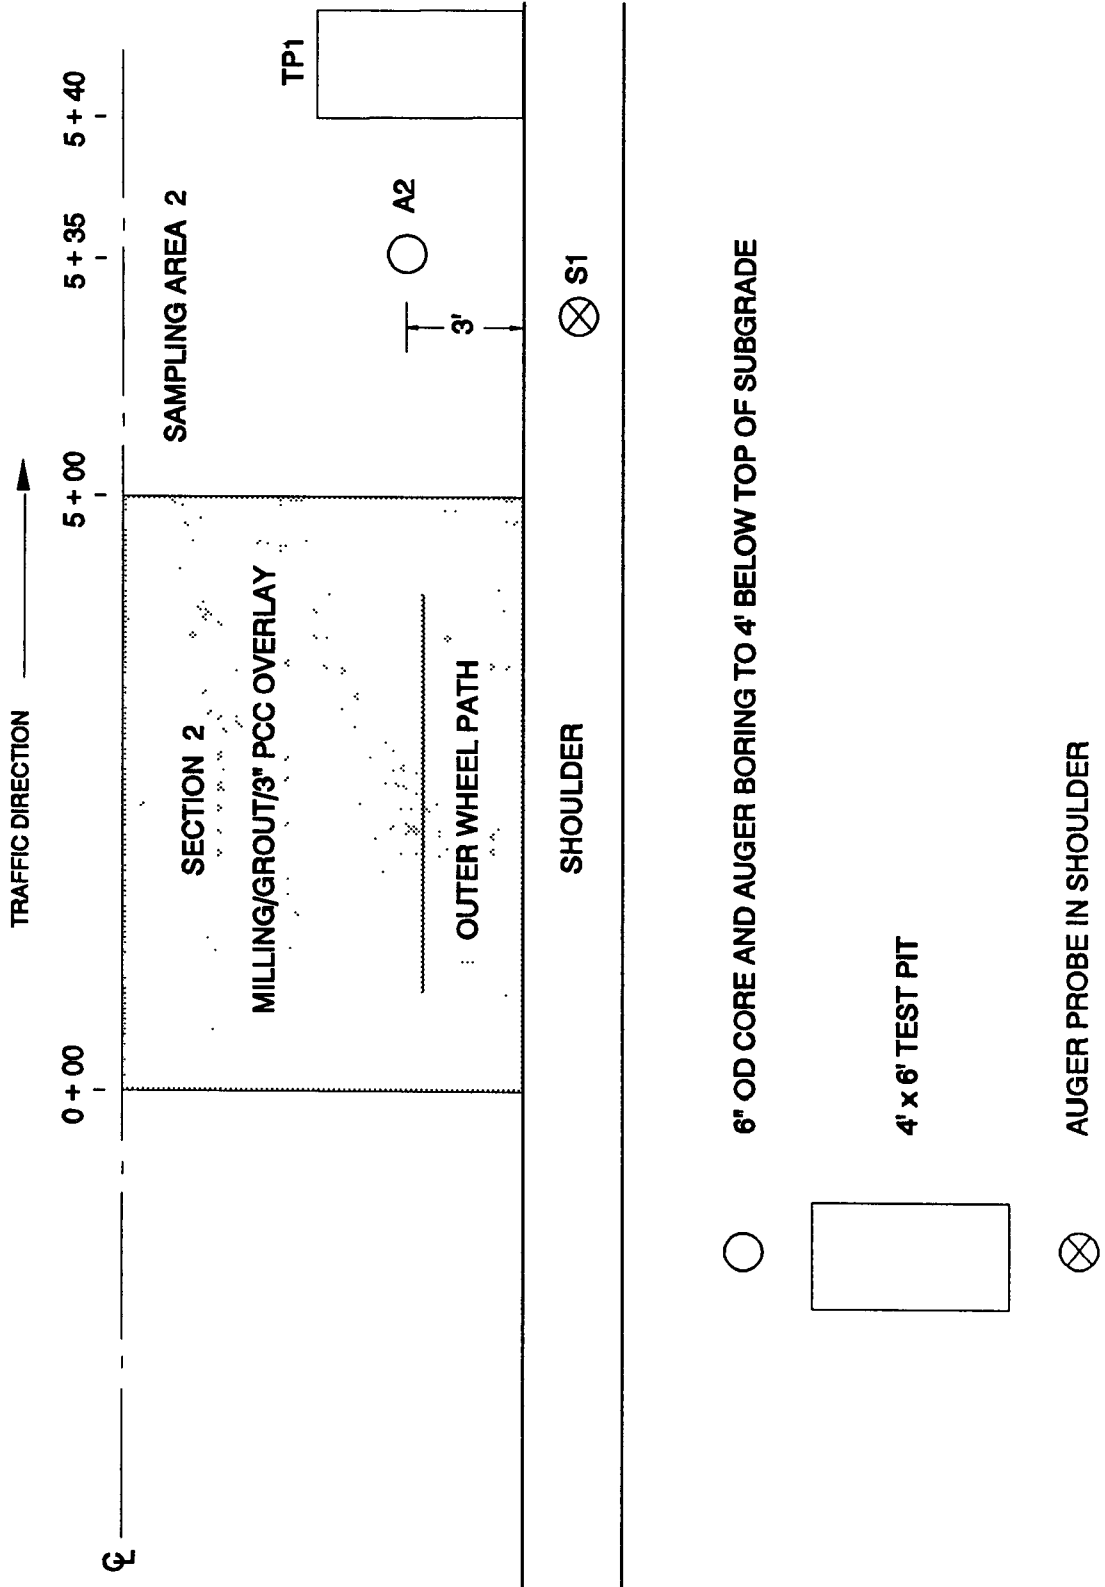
Example of "Pre-Construction" Sampling Plan for Test Section 2
